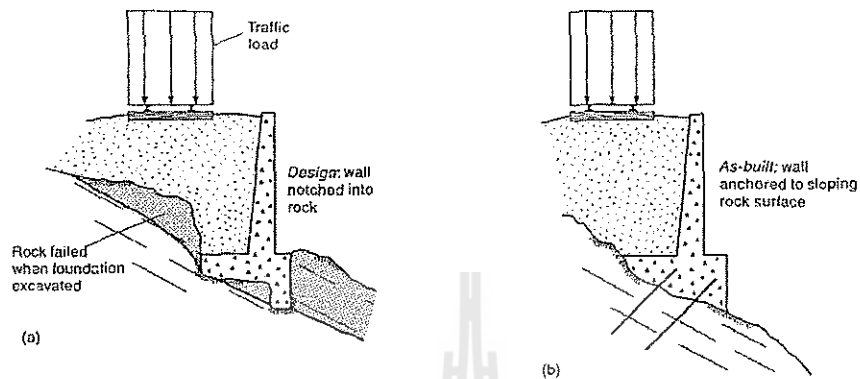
Construction of rock foundation: (a) attempted 'sculpting' of rock foundation to form shear key; and (b) 'as-built' condition with footing located on surface formed by joints.
